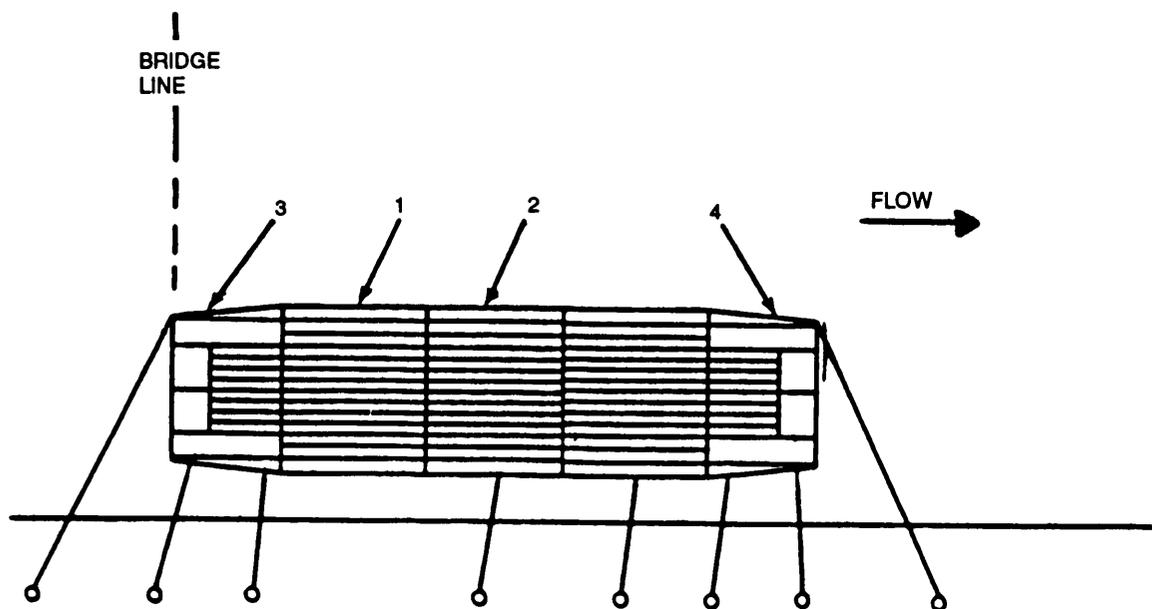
Bridge Assembly Swinging Bridge Method (Sheet 1 of 3).
